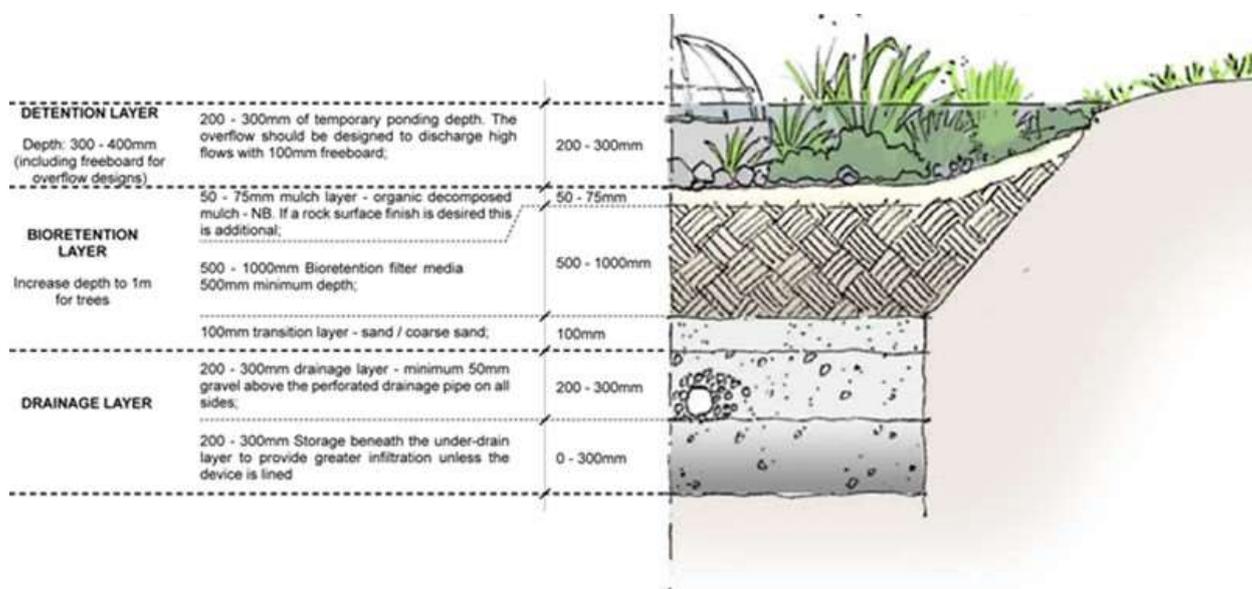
Schematic of a rain garden cross section¹⁰⁷
